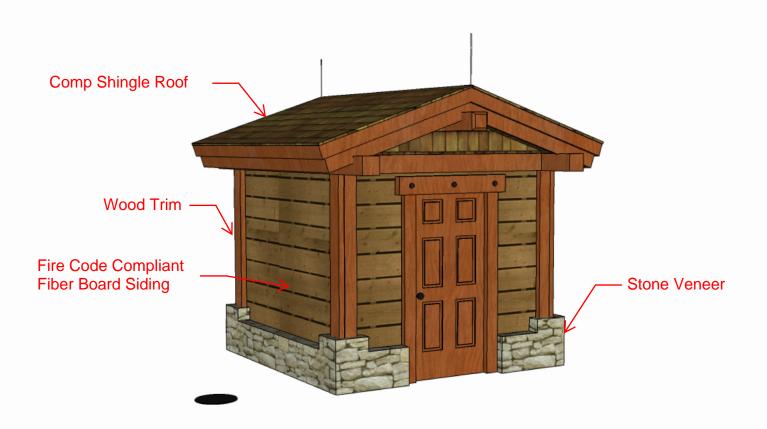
EXHIBIT B WELL EQUIPMENT BUILDING DESIGN
